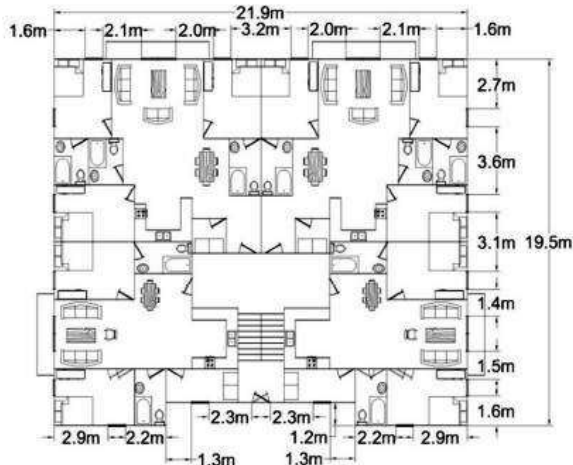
Plan view for each story of the four-story woodframe building (Excerpted from Jennings et al., 2014)
